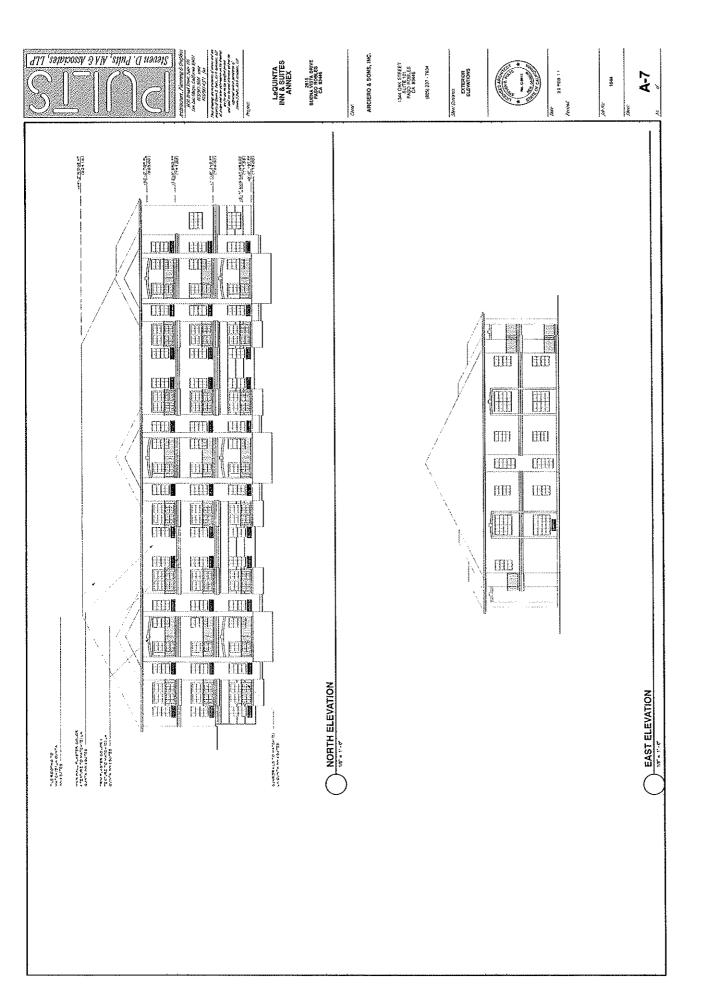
Exhibit I Exterior Elevations PD 03-016 Amendment 2615 Buena Vista Drive (La Quinta)
